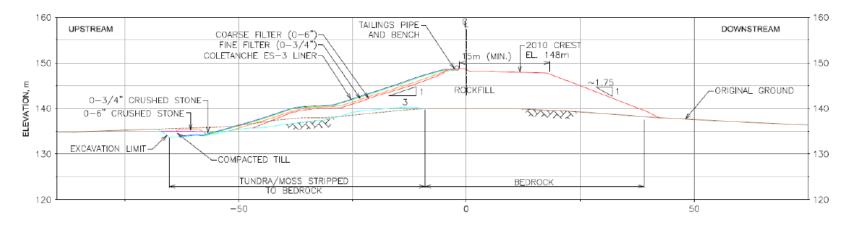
Typical Cross-Section of the Stormwater Dike
